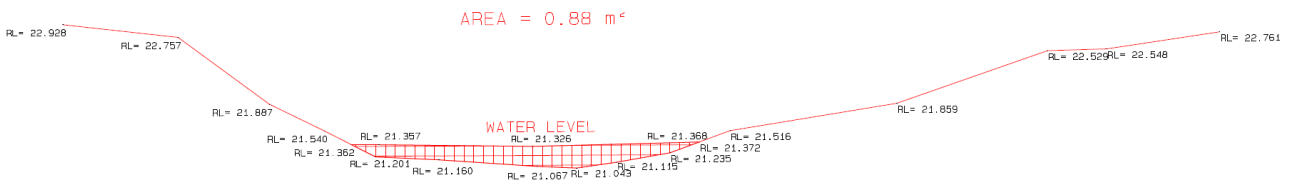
SBT2 Discharge Site – Claremont Creek Survey Cross Section
